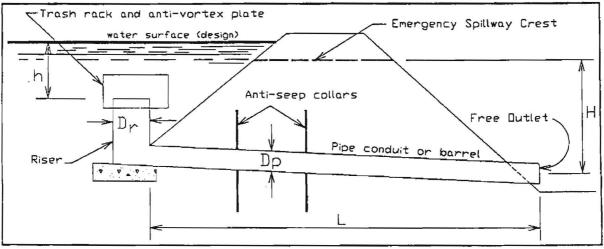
Pipe Outlet Structure with Drop Structure Inlet
